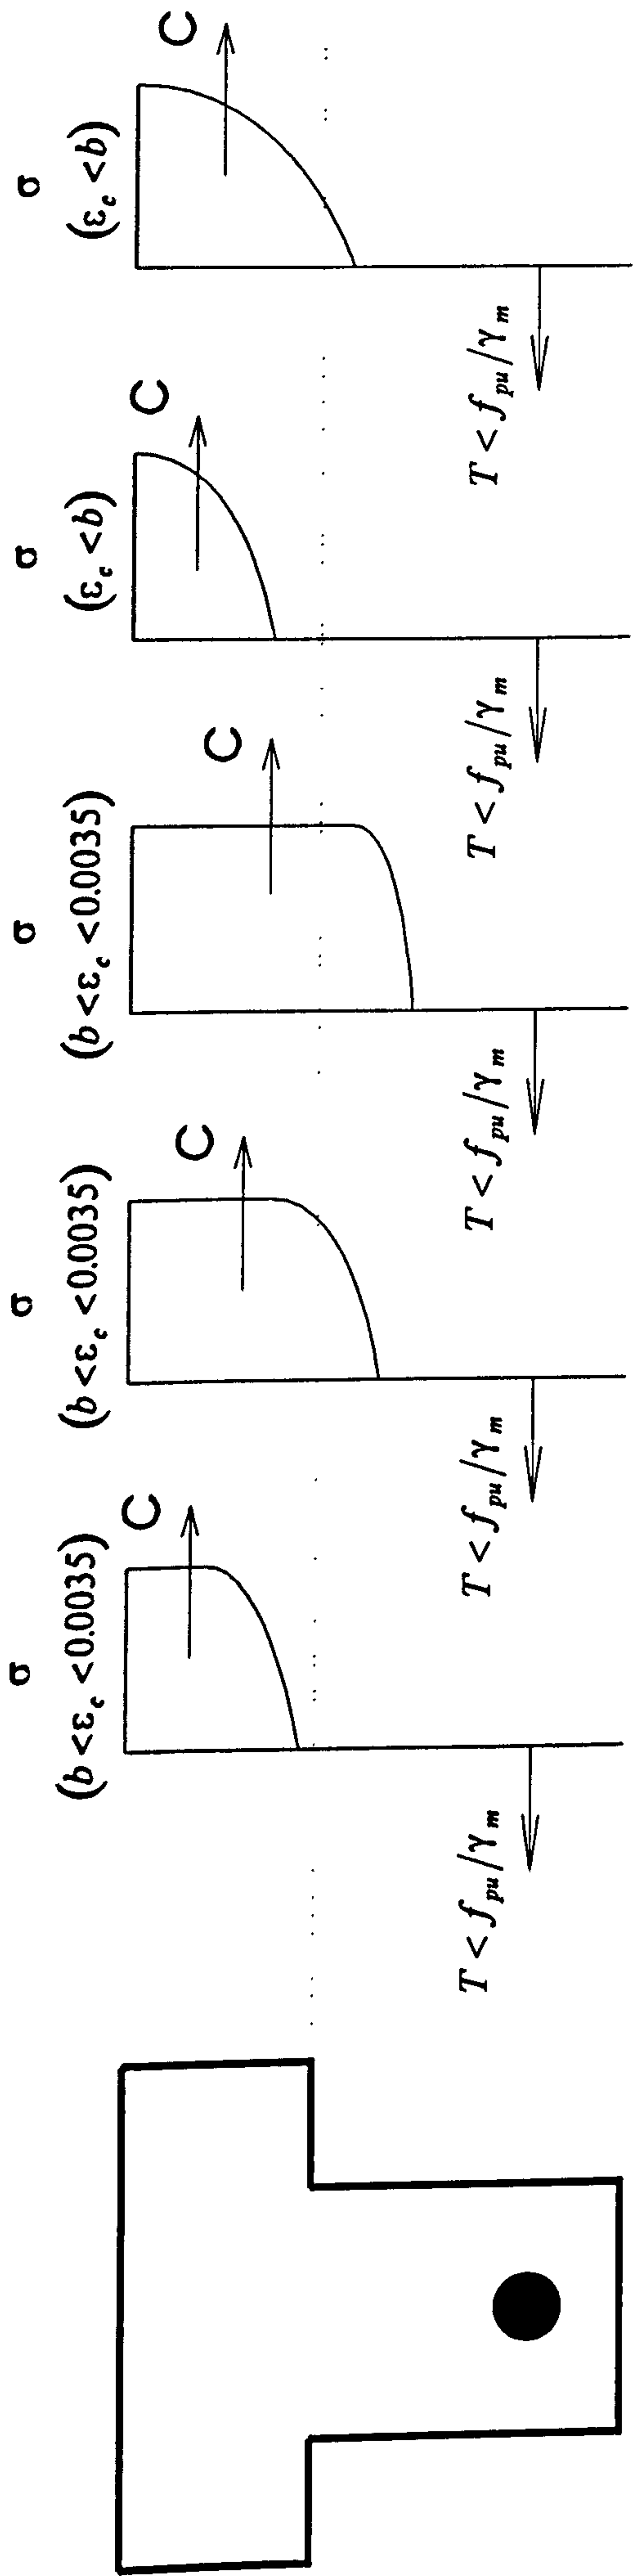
Intermediate Cracked Modes of Prestressed Concrete I and T Sections
